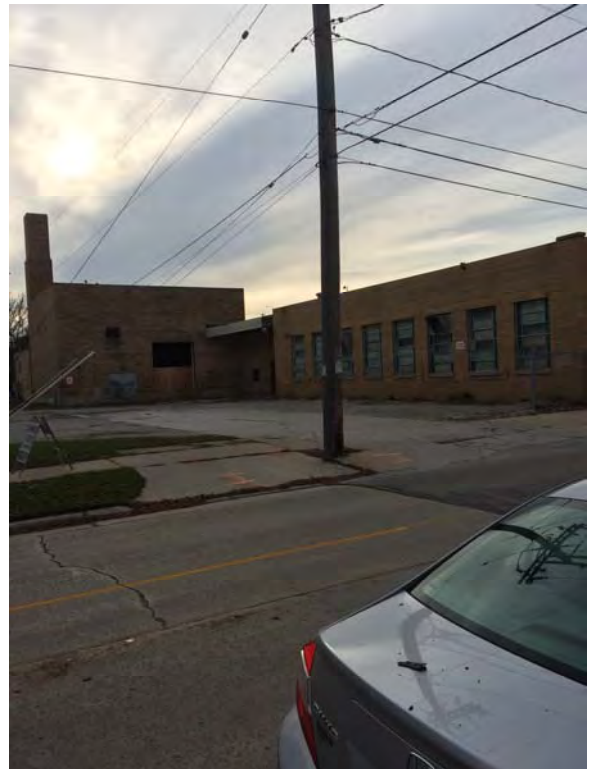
Bay Towel building pre-demolition former tank area along east build wall.
